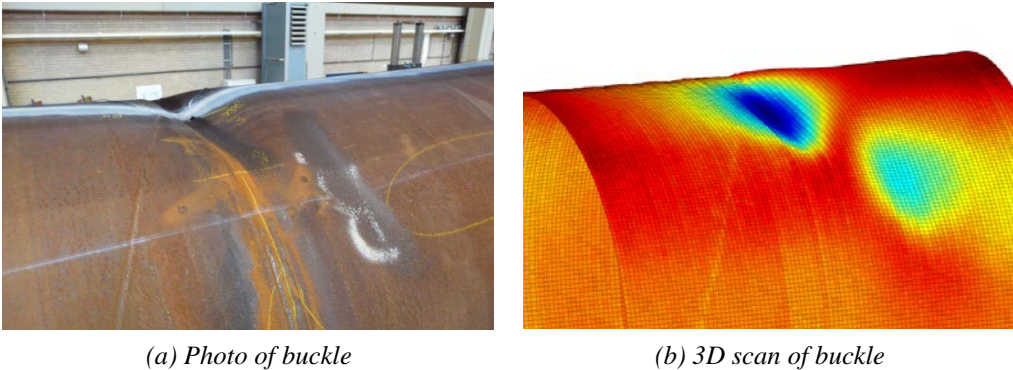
Local buckle in specimen T3 ($D/t=118$) at the girth weld, directly after formation.
